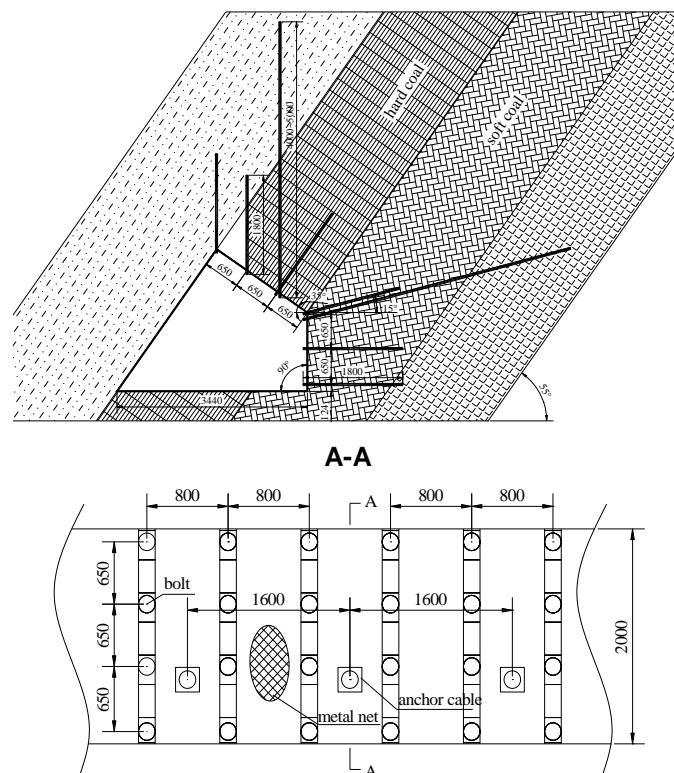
Roadway geometry and the sectional view of the support (mm)
